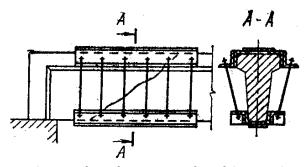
Scheme of reinforcement of prefabricated reinforced concrete roof.
